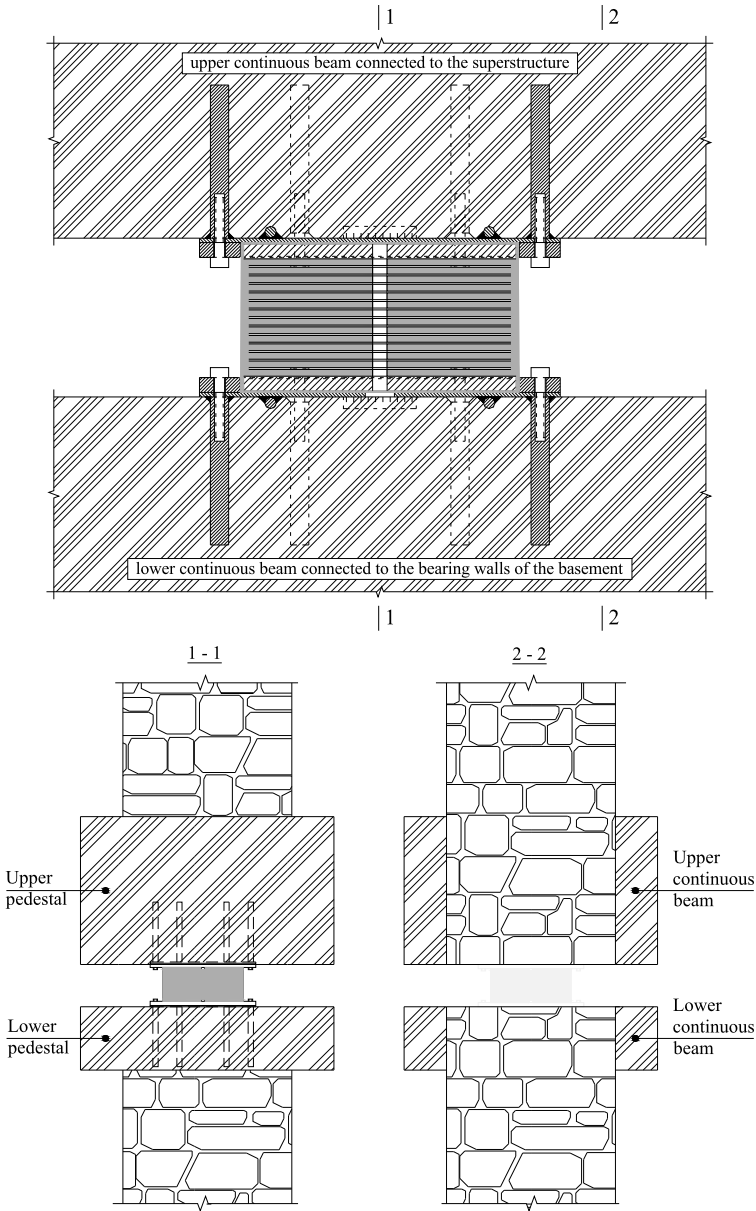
Location of MDRB by upper and lower recesses provided by annular steel rings bolted to the anchors connected to the upper and lower continuous beams in school building
